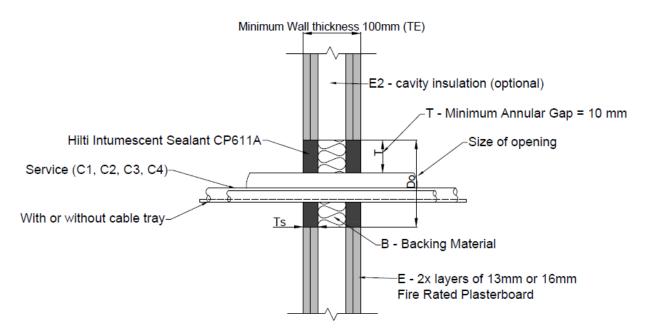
AS 1530.4:2014 D1 Standard Cable Sets Seal Type 4, Side View, Refer to table 8
